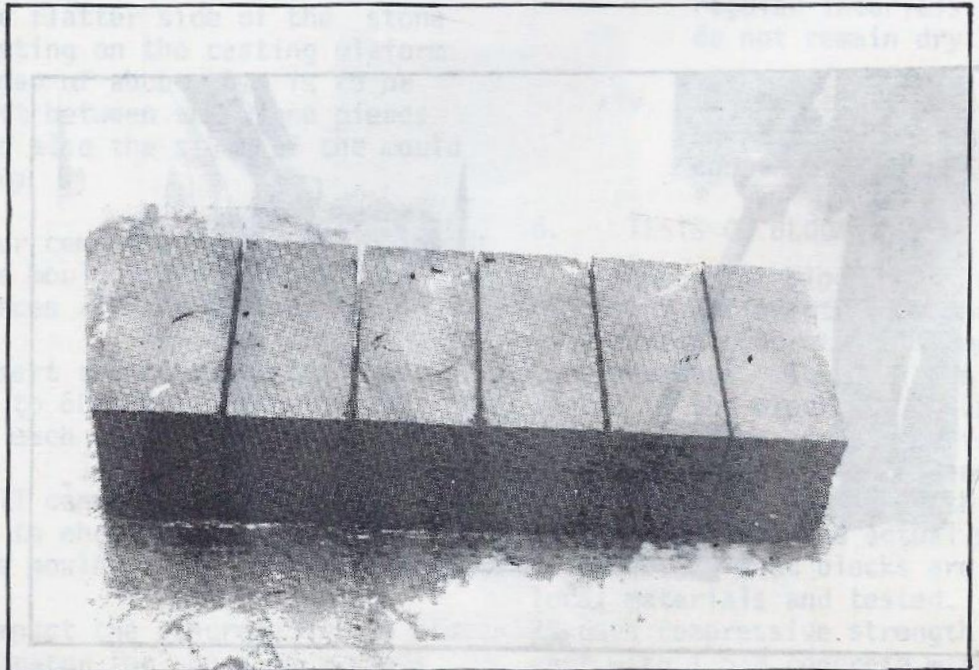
STONECRETE BLOCKS AFTER DEMOULDING (THE STONE TEXTURE IS AT THE BOTTOM FACE)
